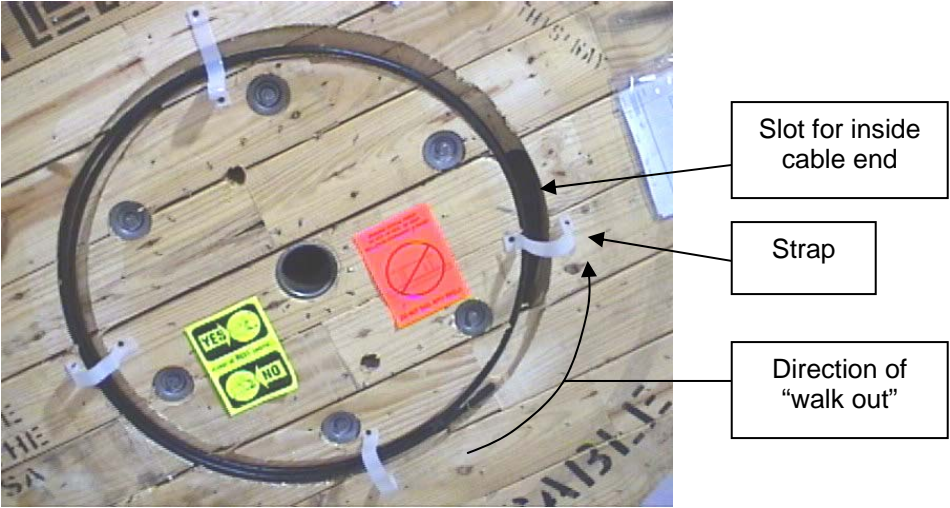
Protective lagging boards removed to expose the inside cable end.
